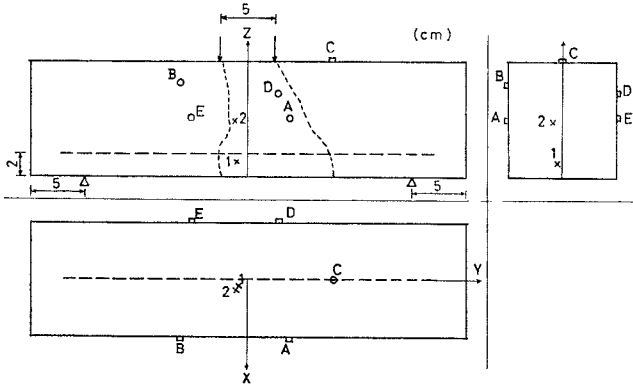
The location of transducers A, B, C, D, E and sources 1, 2 by shear cracks and otherwise in the bending test of the reinforced concrete beam.
